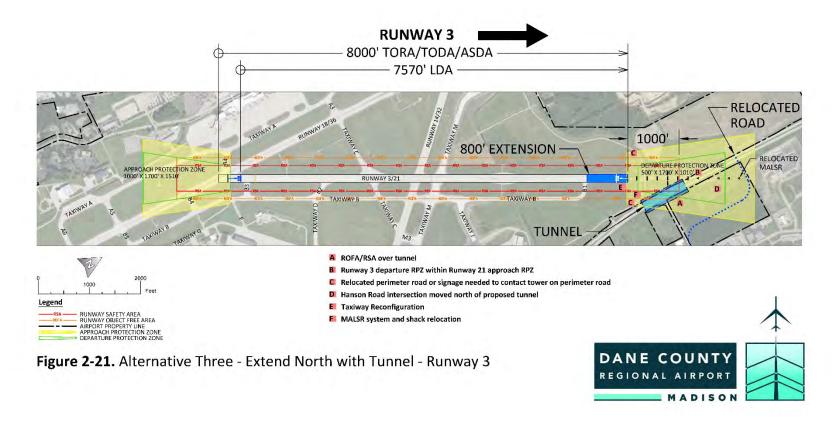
Alternative 3 – Extend Runway 3 North with Tunnel
